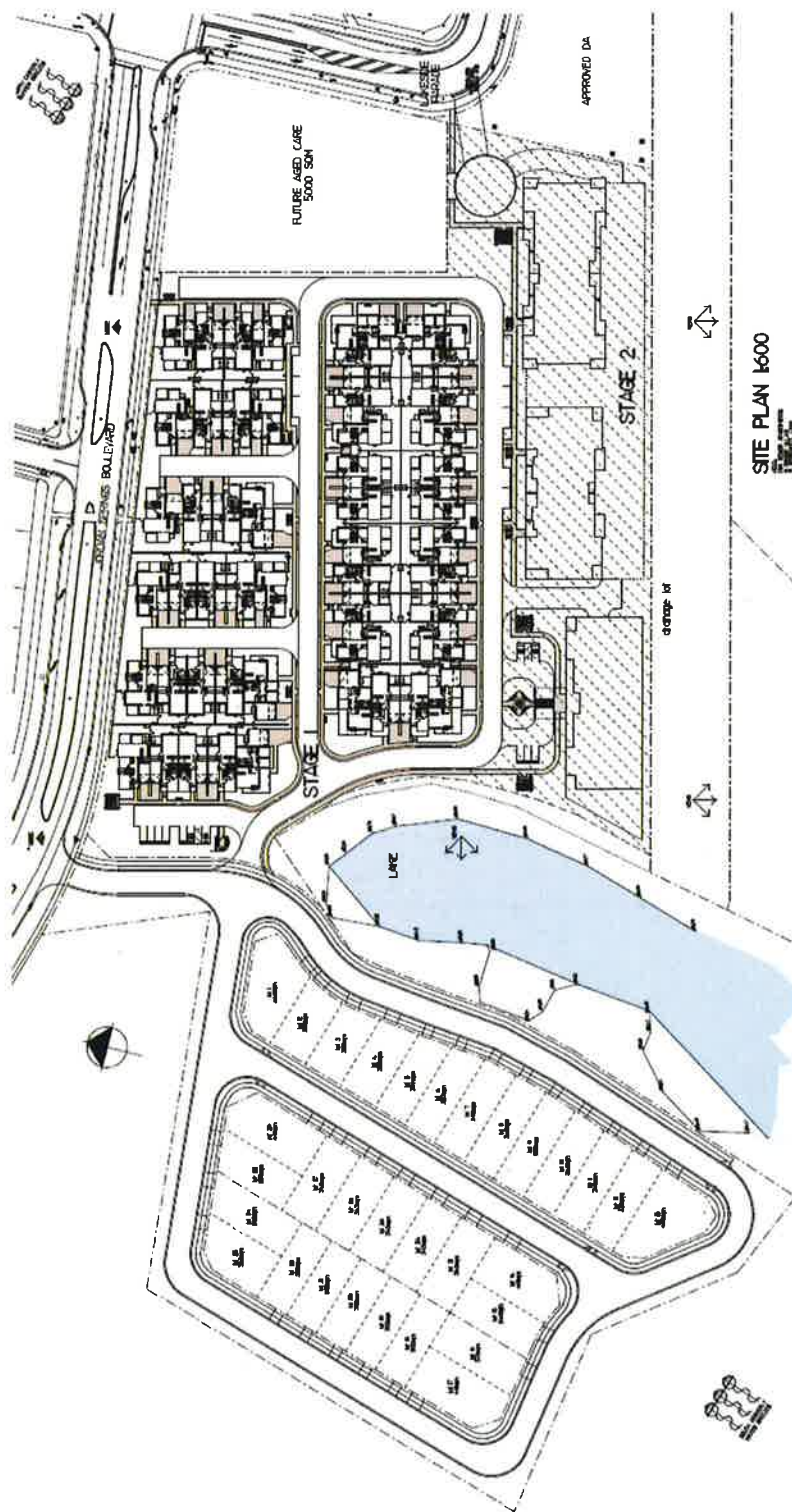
Proposed Stage 1 villas, Stage 2 future building envelopes and separate subdivision for future aged car development (Source: A&N Design Group)
